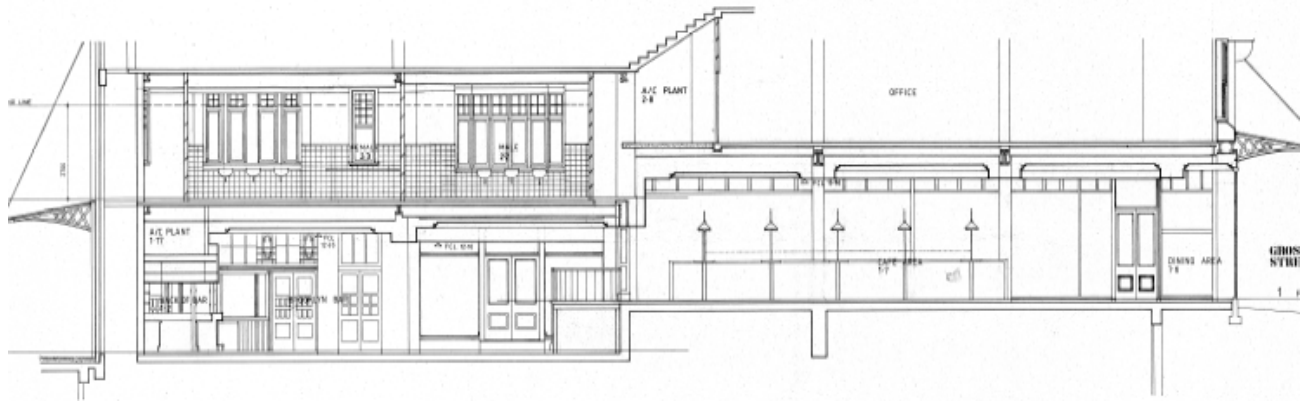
Cross sectional view of the Brooklyn Hotel tenancy (ground floor and first floor across the three sites)
